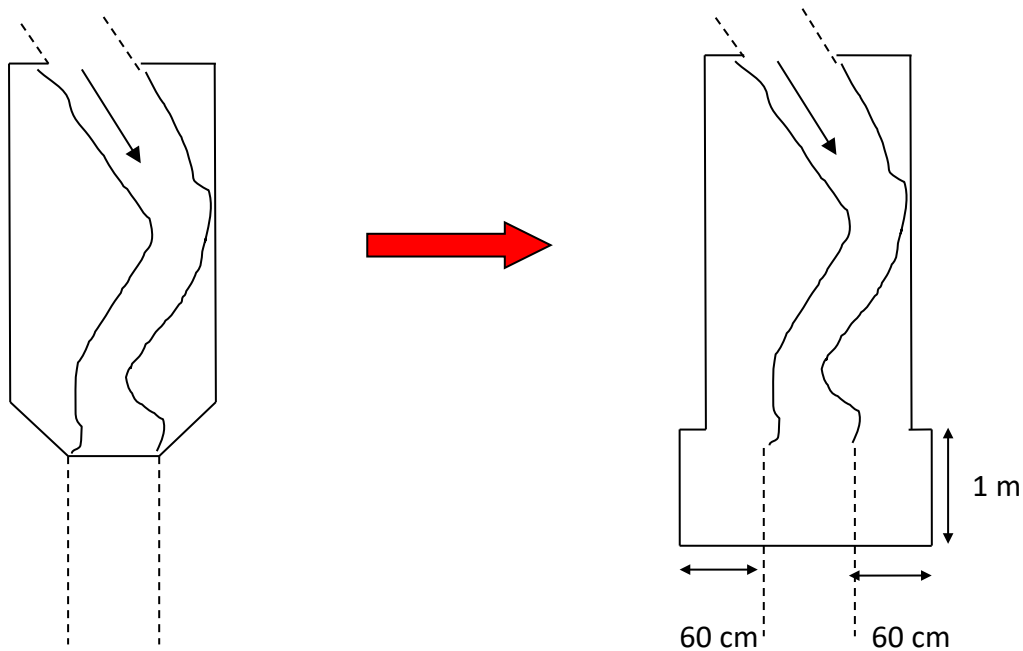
Plan showing excavation downstream and upstream of pipe entrance
